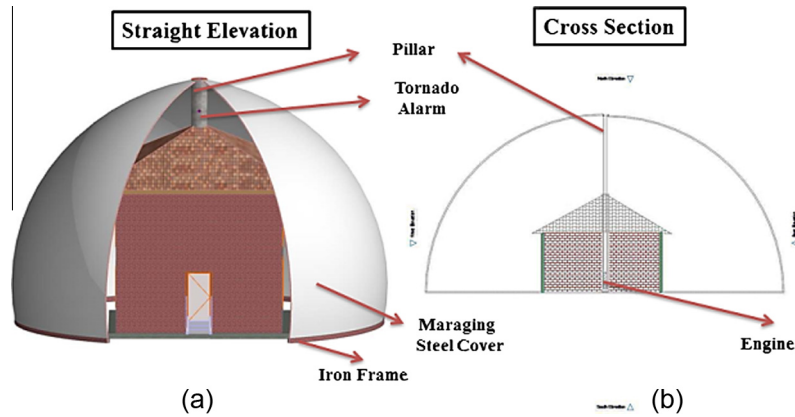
3D CAD model – straight elevation of tornado proof home. (b) Cross section with missile steel and shield technology.
